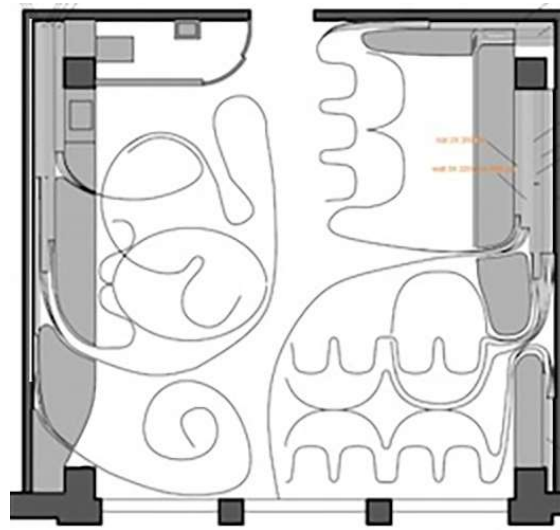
Floor plan of Pop-Up Interactive Apartment
